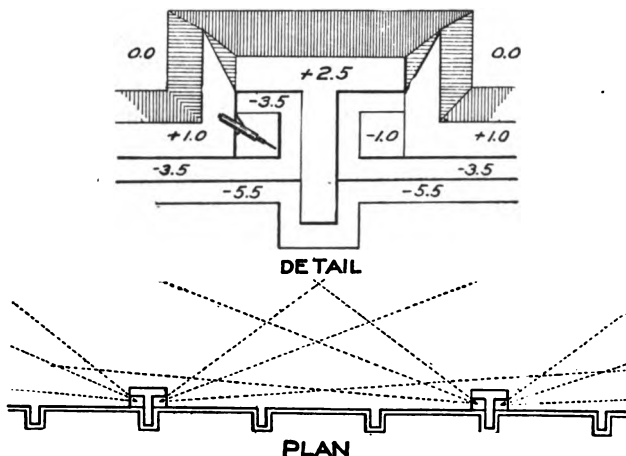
MACHINE GUN EMPLACEMENT FOR CROSS FIRE
